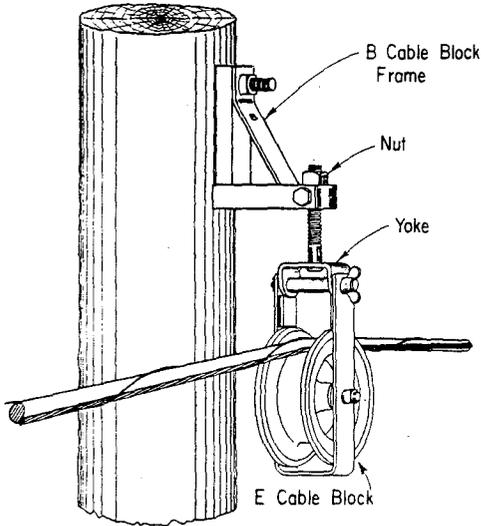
B Cable Block Frame (With E Cable Block Installed)
